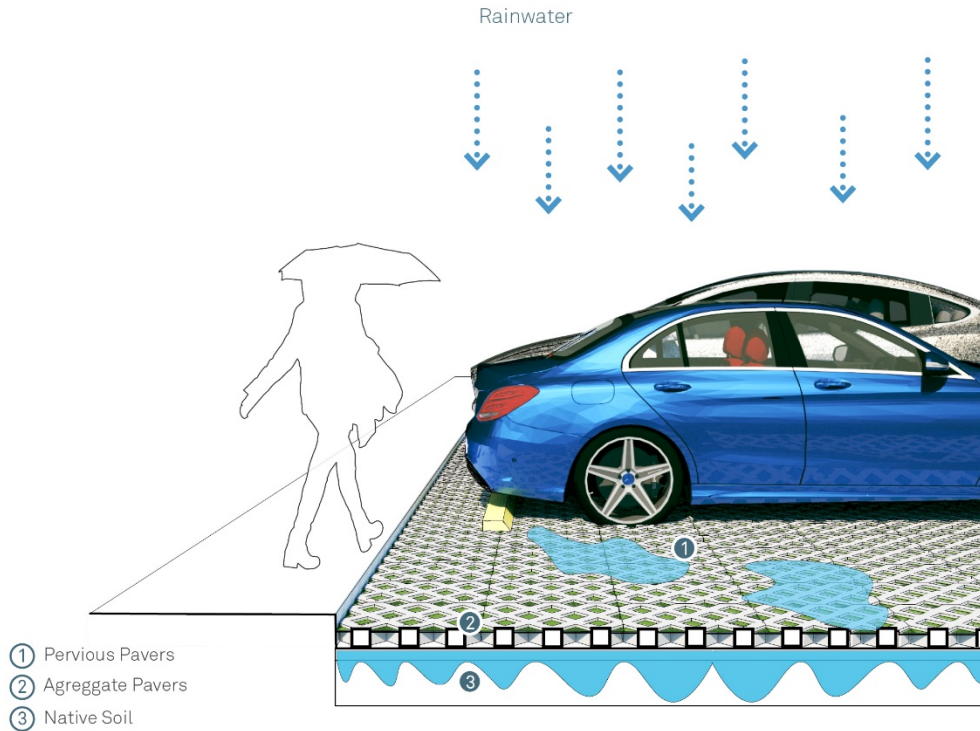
Pervious pavement detail (<https://www.grantspassoregon.gov/280/Pervious-Pavement-Alternative>)
